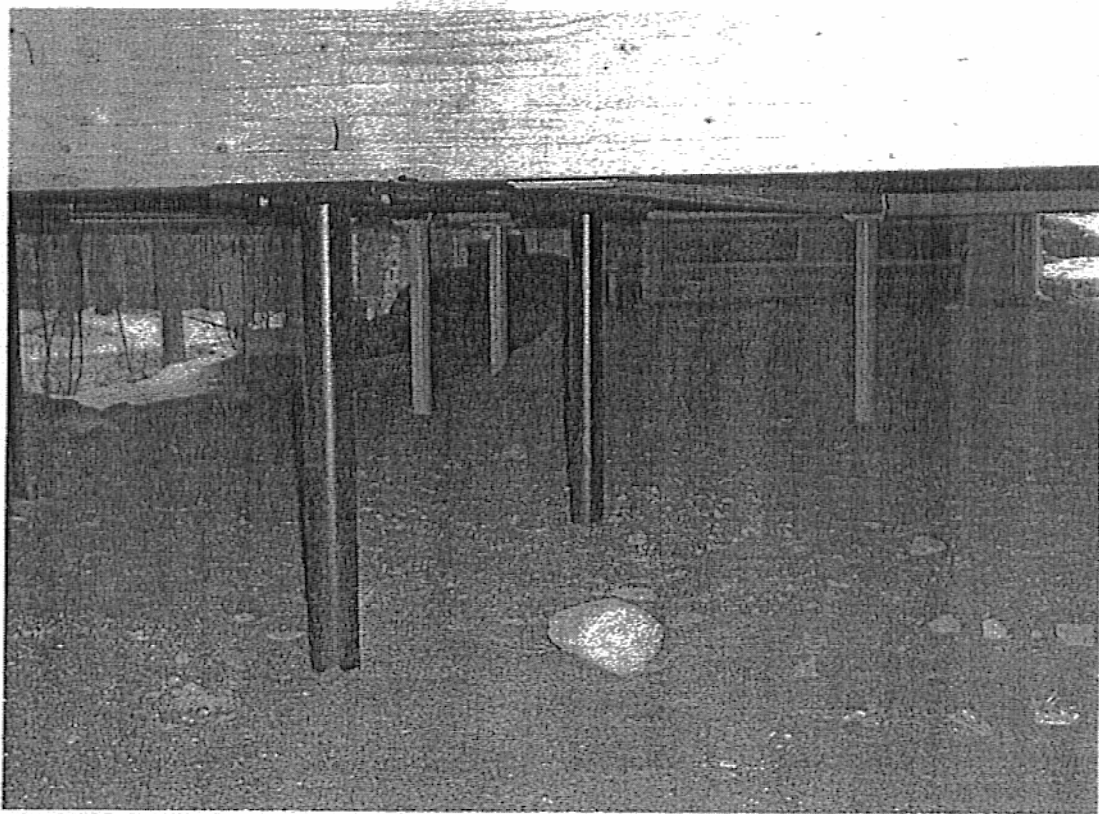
Ventilated ground floor with piles in Lappeenranta /5/.
